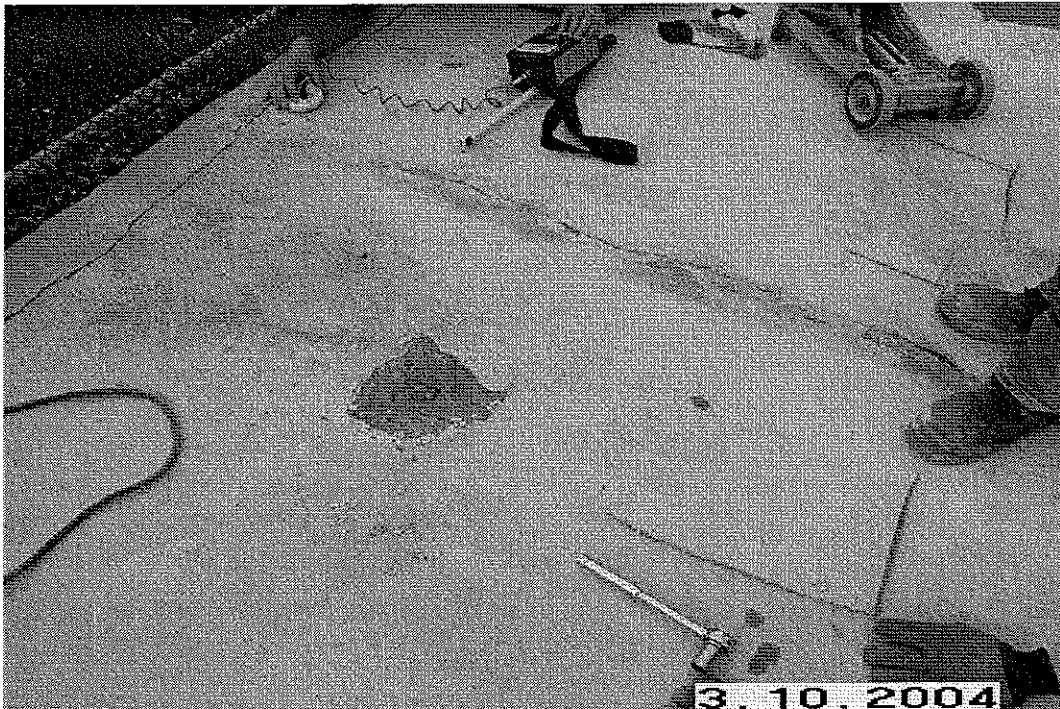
Rebar Detection and Spall at West Side
